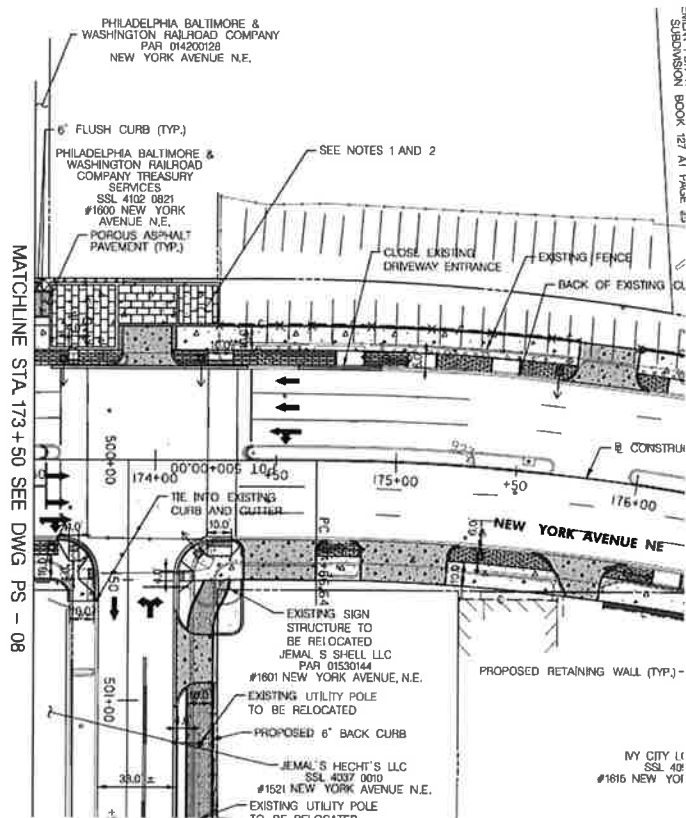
New York Avenue Trail and Streetscape Concept Plan for New York Avenue & 16th Street NE (Source: DDOT)
